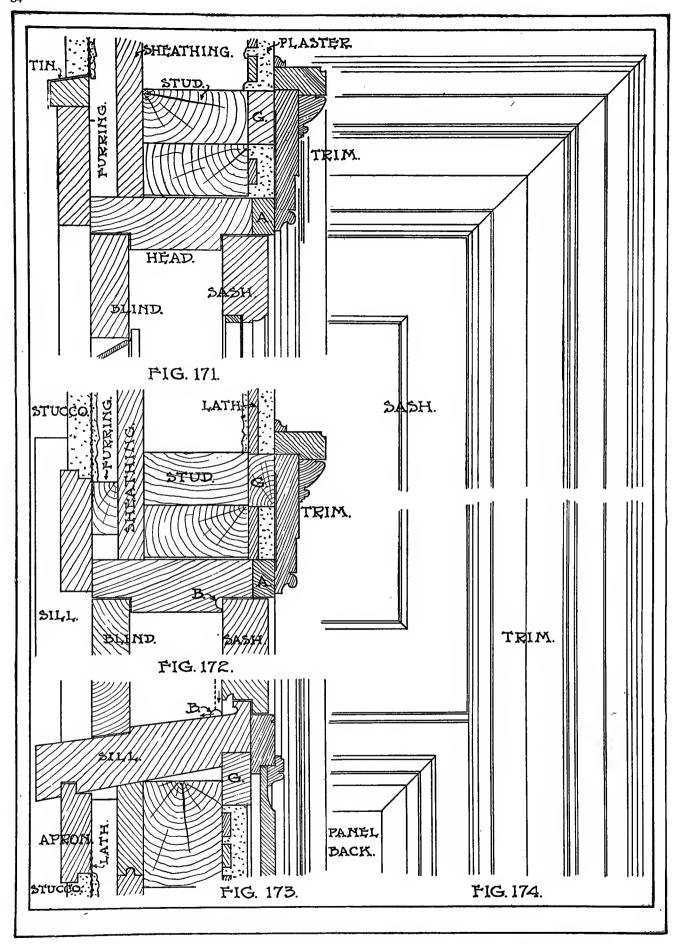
INWARD OPENING CASEMENT IN CEMENT STUCCO WALL
